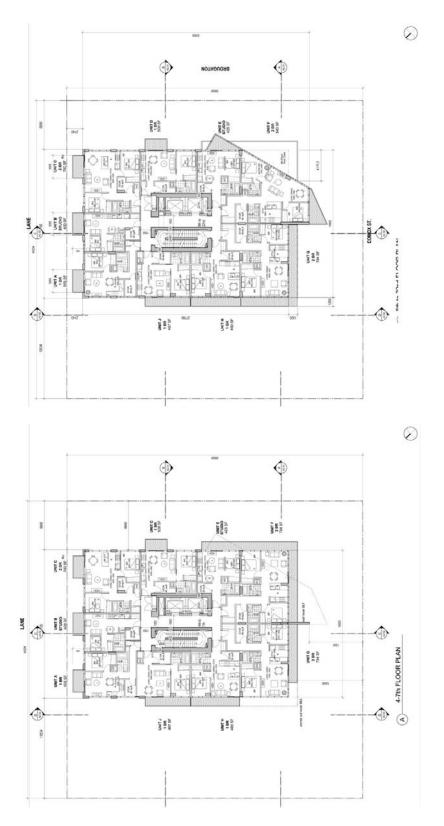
Floor Plans - Levels 4 to 7 and 8 to 22 (Typical Floor Plans)
